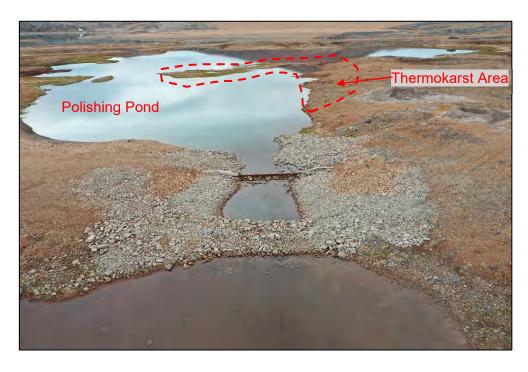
West Twin Outlet Wall – Overview, as seen from UAV.
